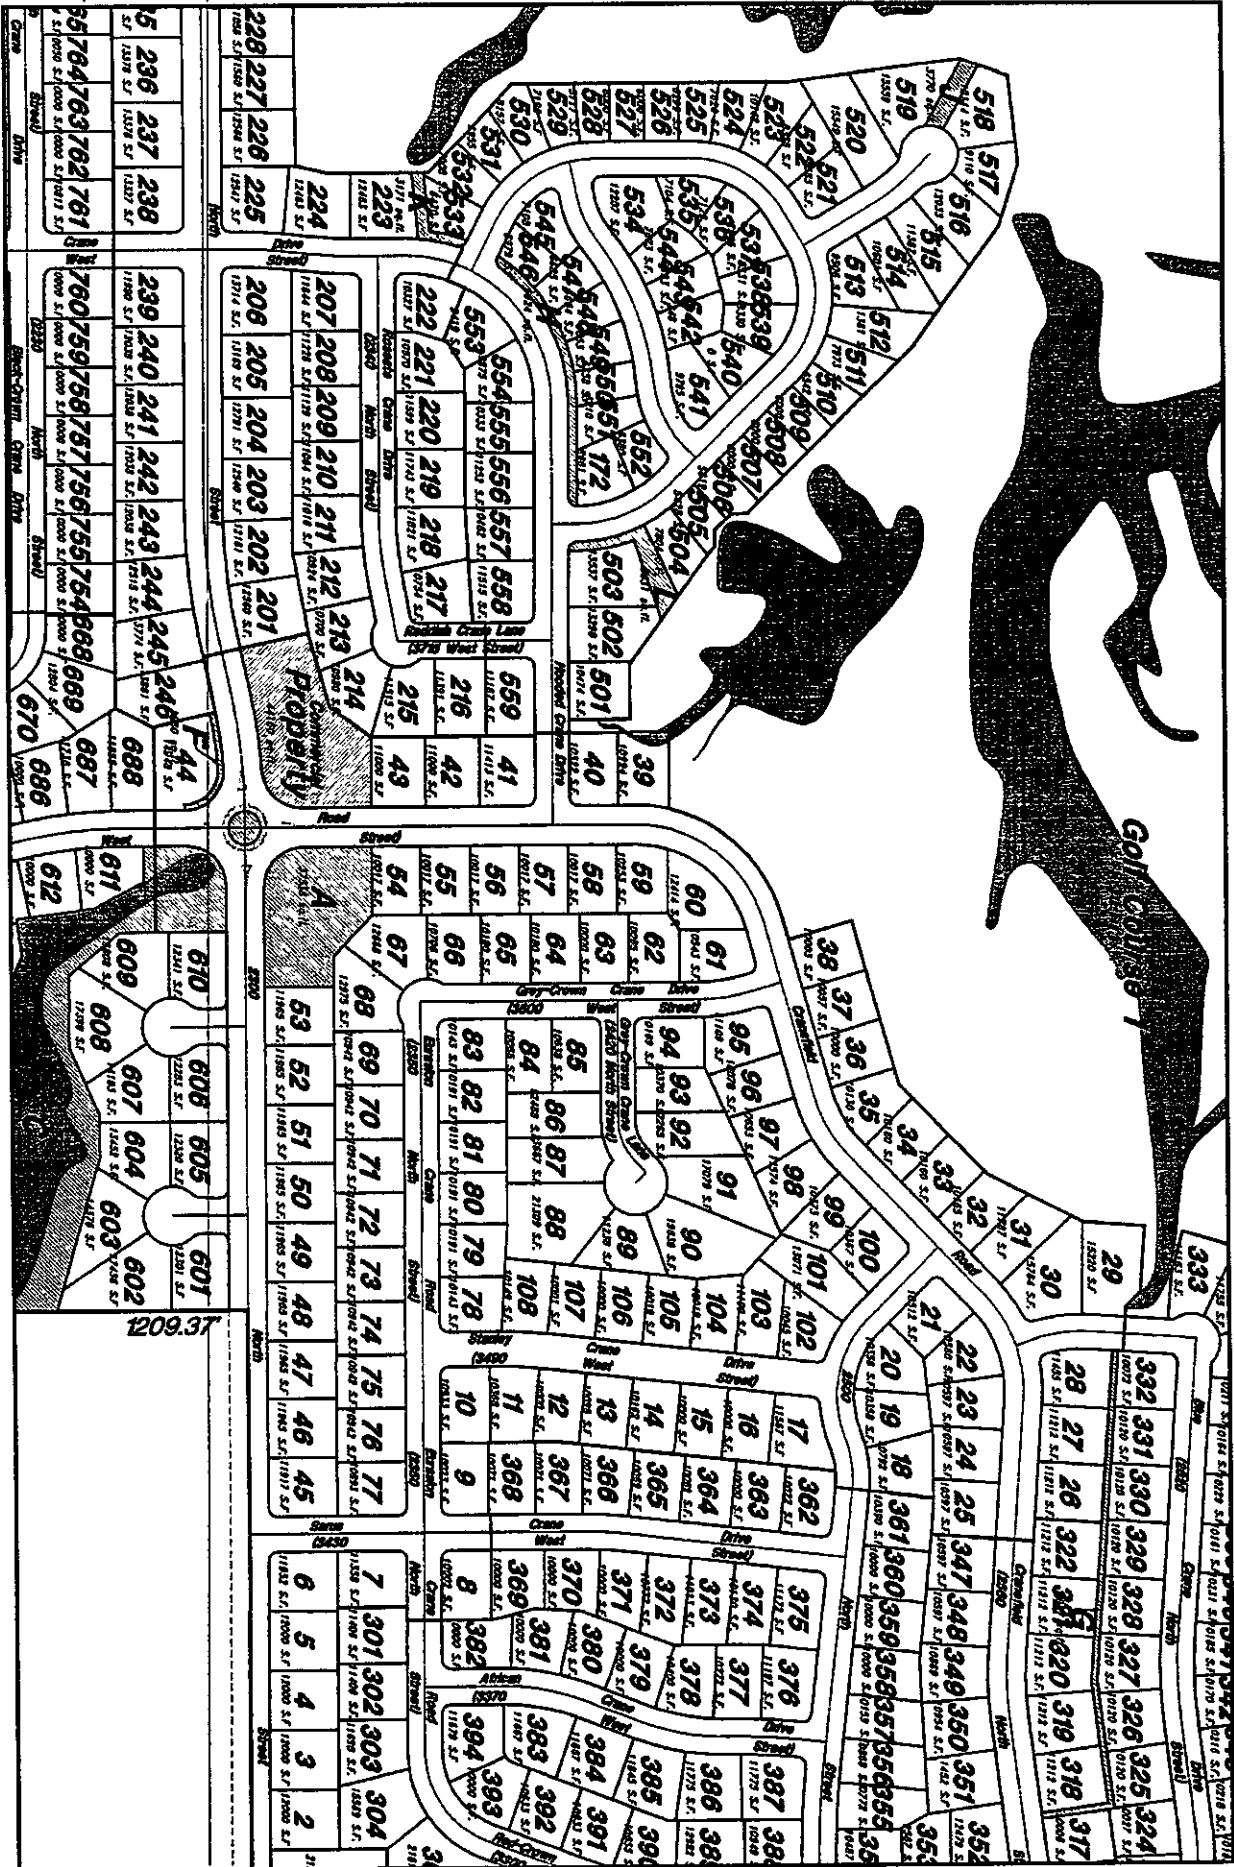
EXHIBIT "B" THE CRANE FIELD ESTATES SUBDIVISION PRUD PRELIMINARY PLAN (AMENDED)
